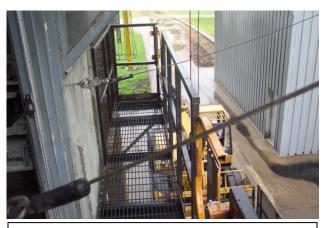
New platform to access railcars from load out room, two fall arrest cables
